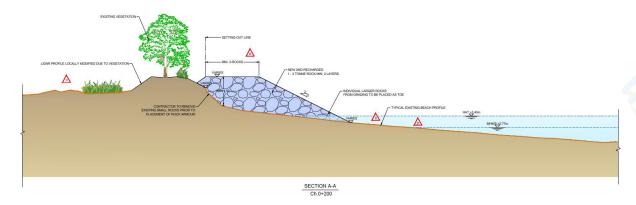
Cross-section of proposed works at Kitchen Porth (HR Wallingford, 2022)
